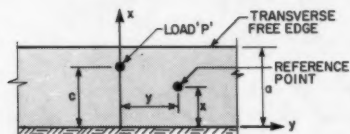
Plan of an Infinitely Wide Cantilever Slab
